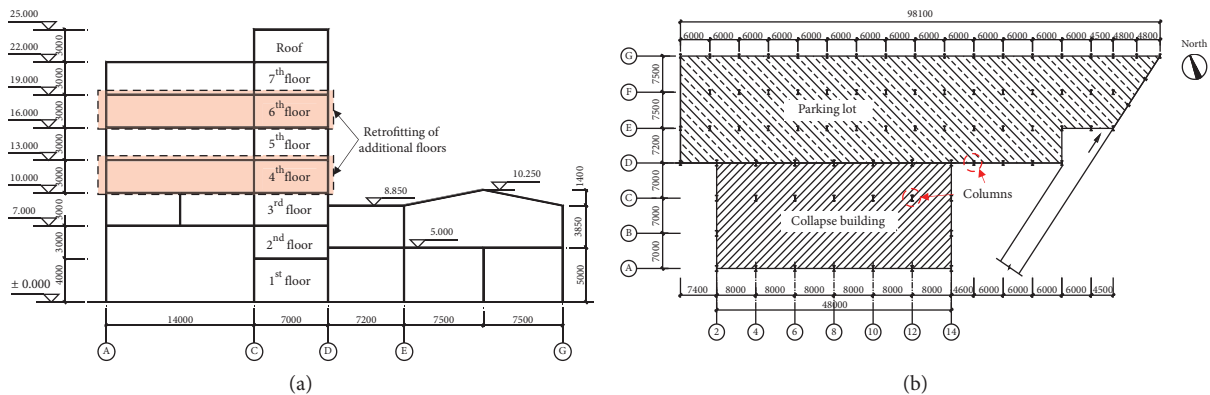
Basic views of the building. (a) Elevation view (the elevation units: m; other units: mm). (b) Plane view (units: mm).
